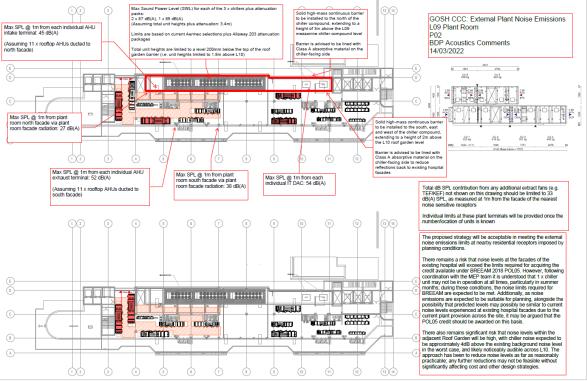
Proposed plant layout – GOSH CCC: External Plant Noise Emissions – L00 Plant Room (drawing provided by BDP Acoustics dated 14/03/2022)
